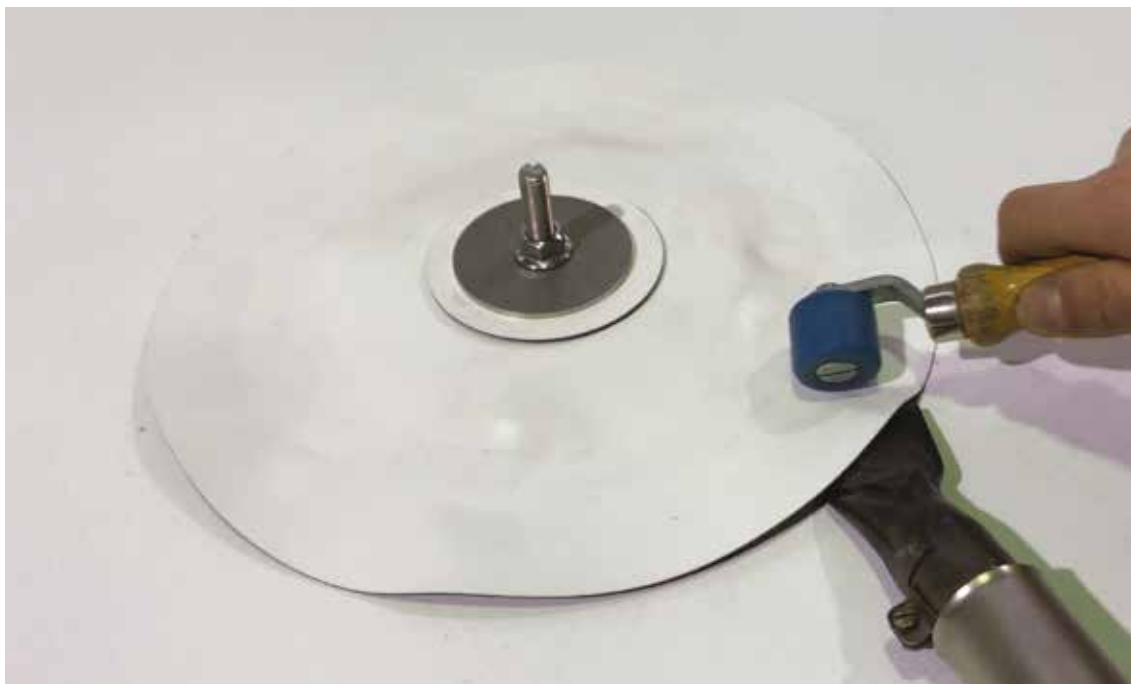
Final hot air welding of the Mapeplan® T connection patch
